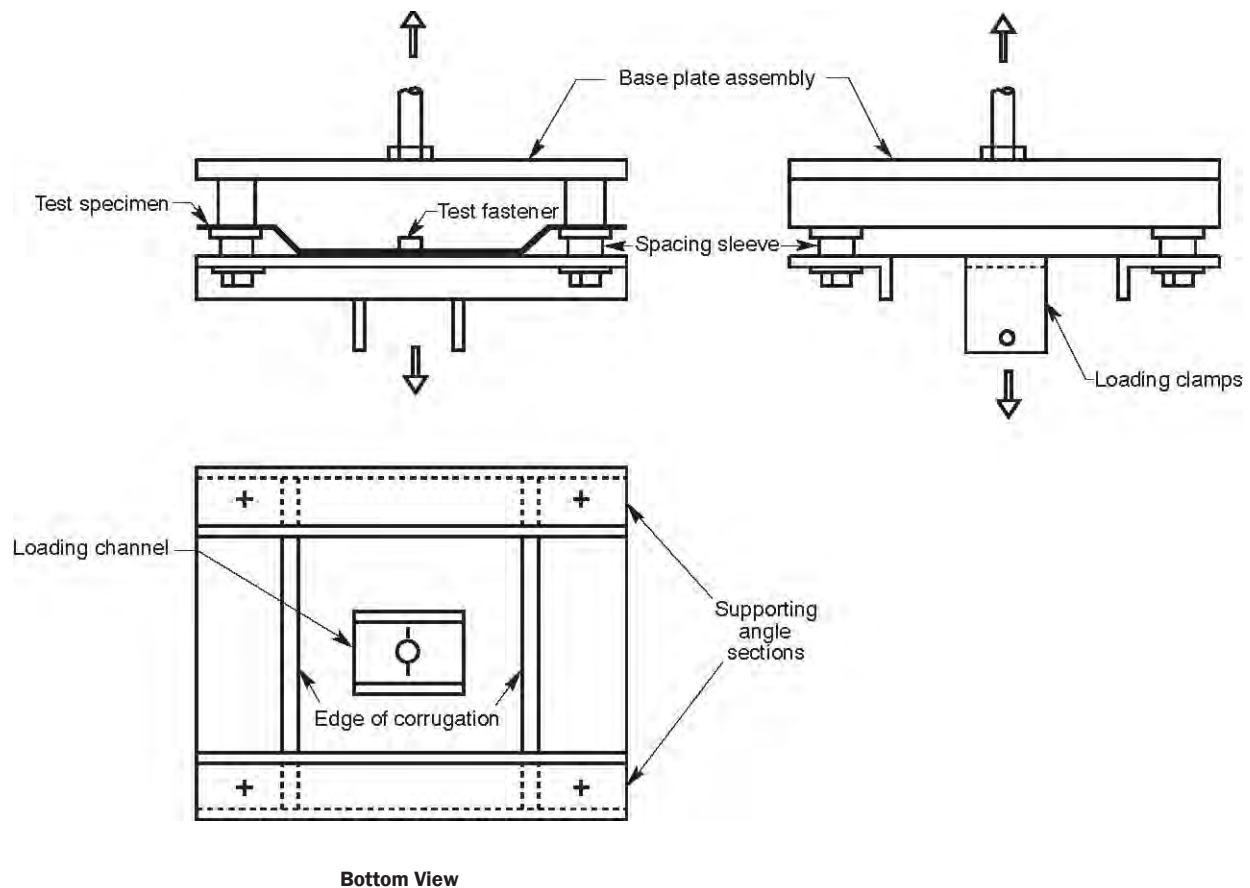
Specific Standard Tension – Test Specimen and Fixture, units – in. (mm)
